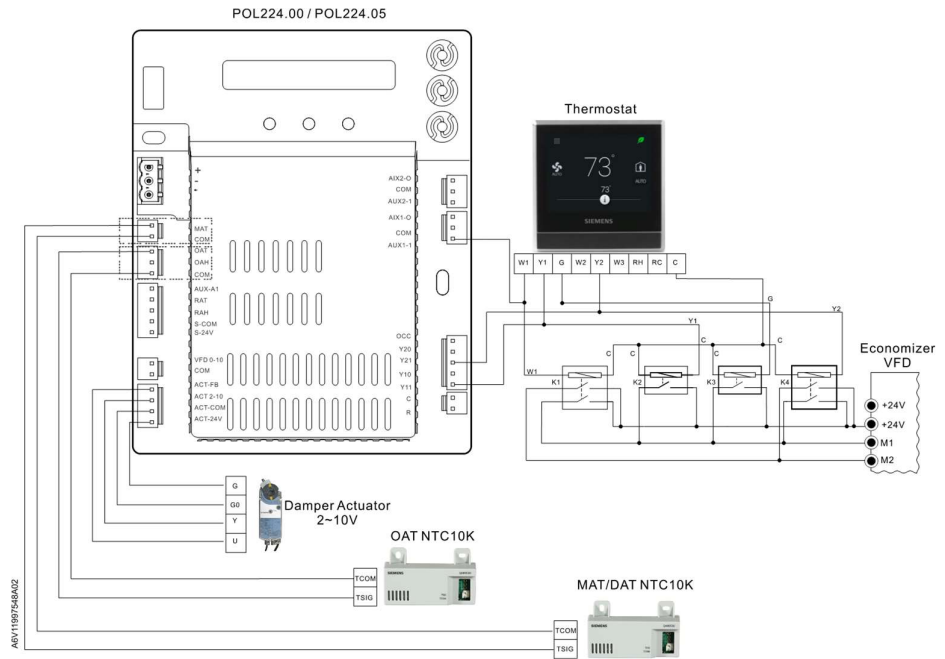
Single Dry-Bulb Switchover + Thermostat + Damper Actuator + OAT & MAT Sensors
